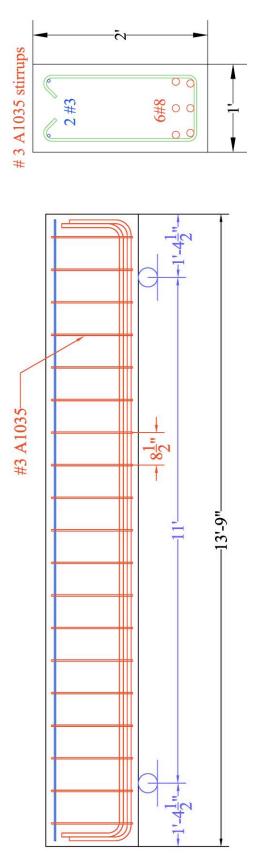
Elevation and Cross-Section Details for Specimen SR5
